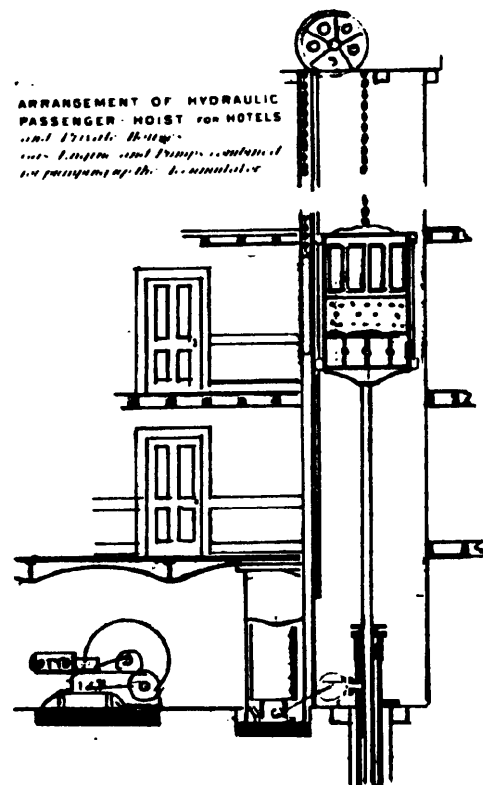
Arrangement of hydraulic passenger hoist for hotels and private houses
